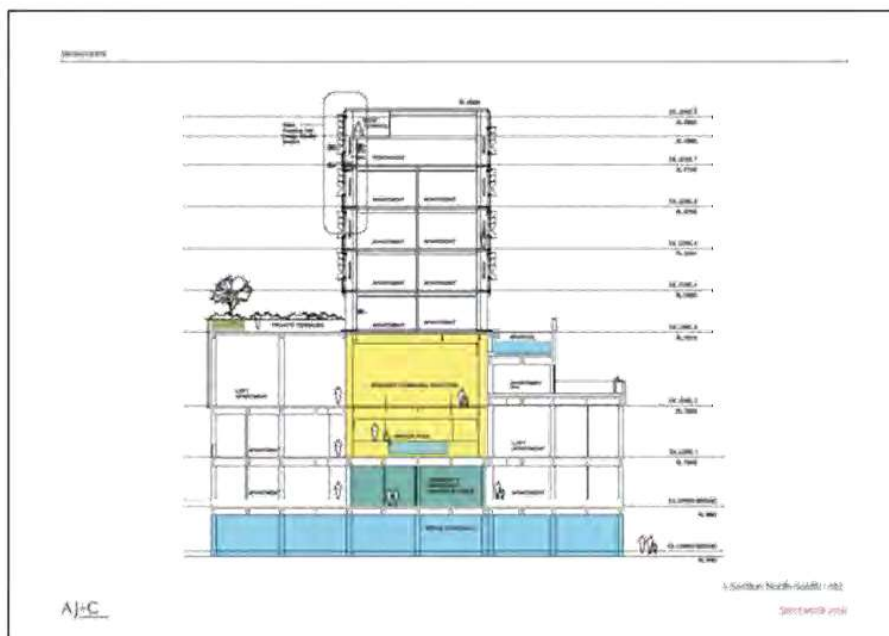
Proposed Section North-South (AJ+C, dated September 2019). This section illustrates that all of the existing roasting tower and hall will be conserved.
